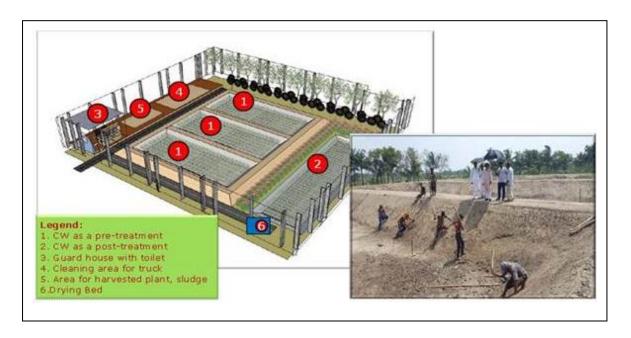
6 Fecal sludge treatment plant construction over passive landfill site in Khulna.
